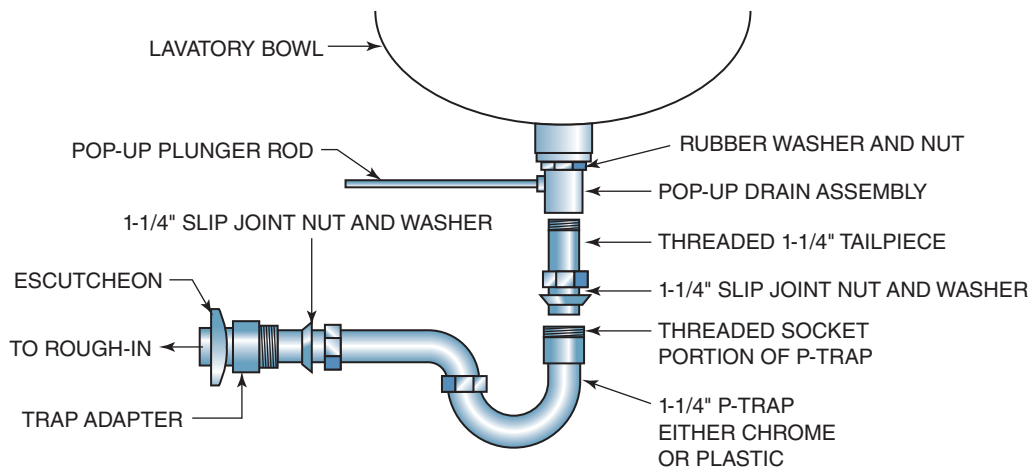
A p-trap, installed to prevent sewer gas from entering an occupied area, is connected to the lavatory outlet.
